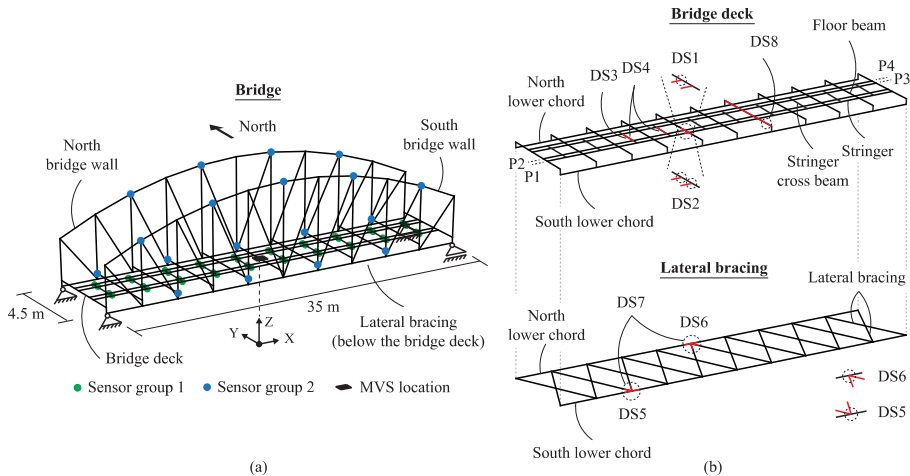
Overview of the Hell Bridge Test Arena. (a) Bridge layout, including the locations of the modal vibration shaker (MVS) and sensors. (b) Damage introduced to the bridge deck and lateral bracing.
